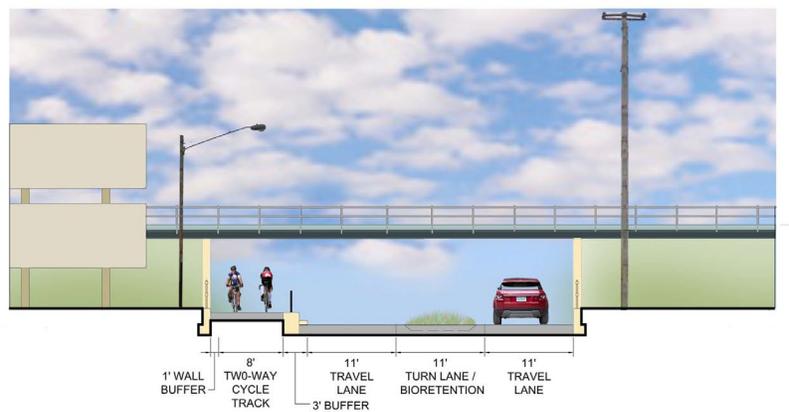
16th Street Underpass (8th Avenue to 7th Avenue)
